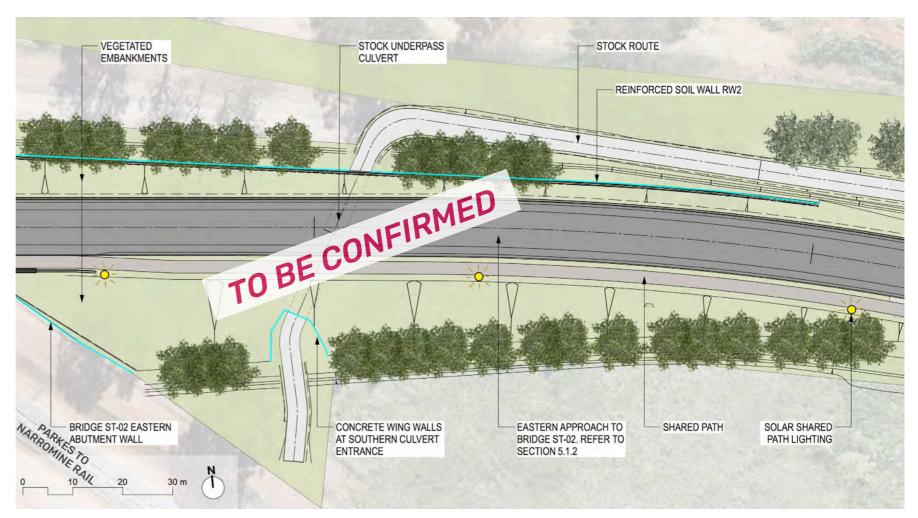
Location of stock underpass culvert in bridge ST02 eastern embankment
